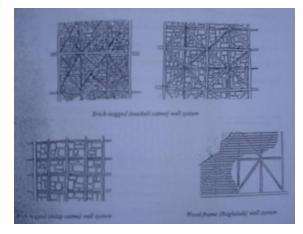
Arabahmet Houses' Wall Details. Source: Bağışkan, 2005.
